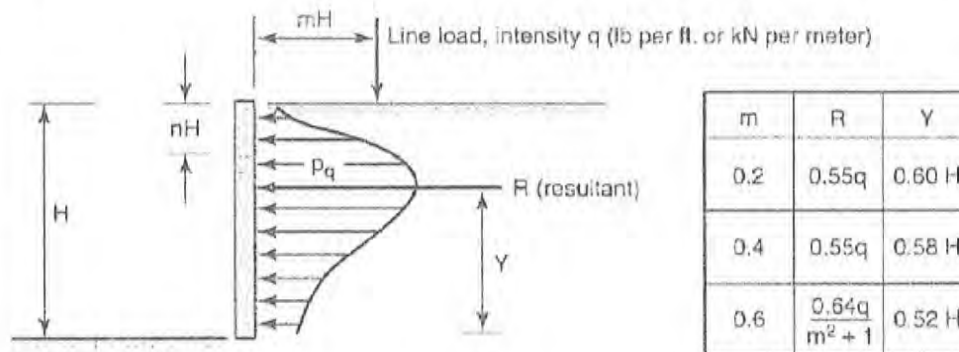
Pressure distribution against vertical wall resulting from line load of intensity q .
